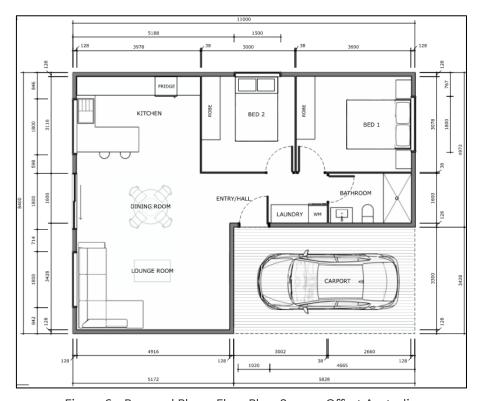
Proposal Plan - Floor Plan. Source: Offest Australia
